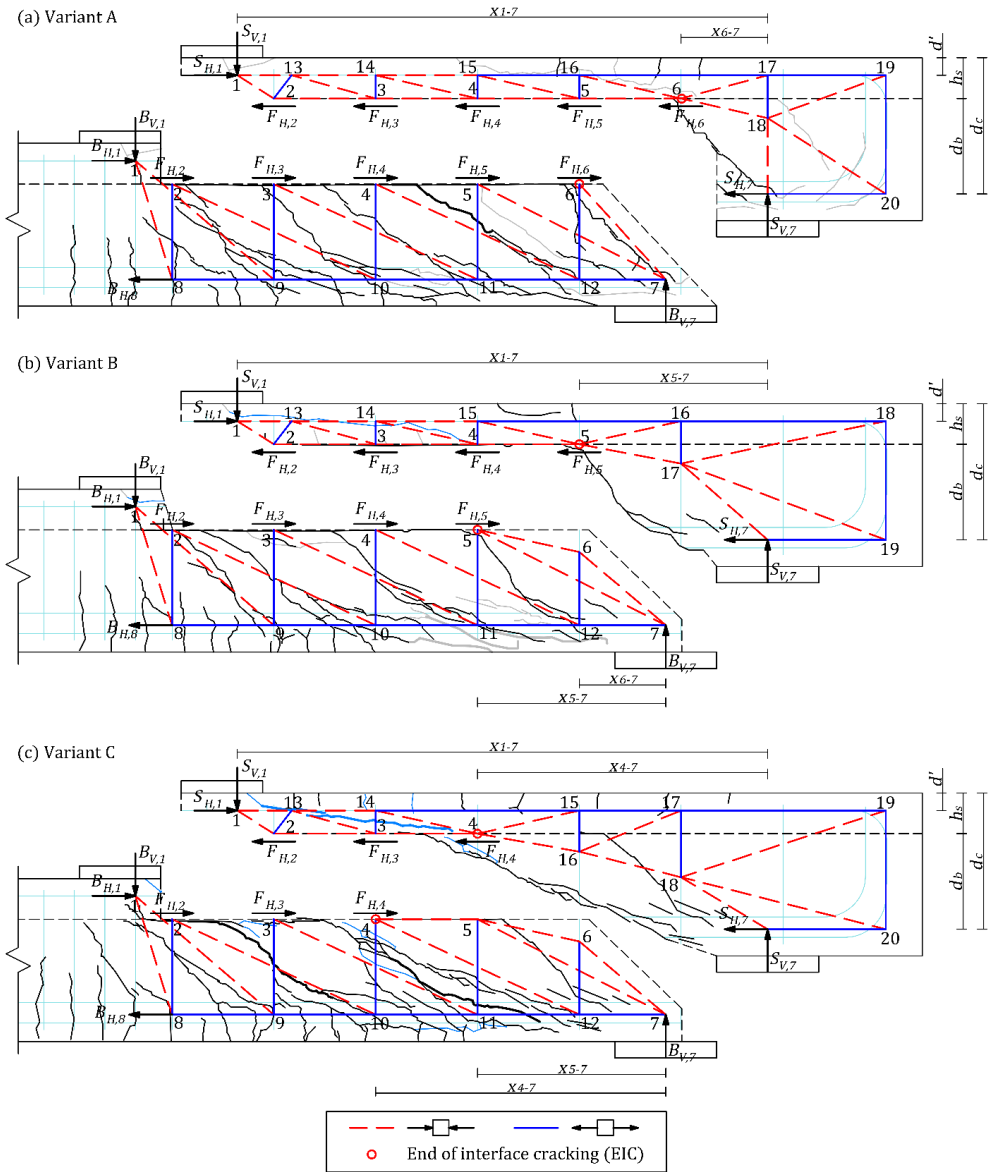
Proposed strut-and-tie models for the precast beam and the cast-in-place slab separately: (a) Variant A (specimen HWP5D2); (b) Variant B (specimen HWP5C2); (c) Variant C (specimen HWP6C1).
